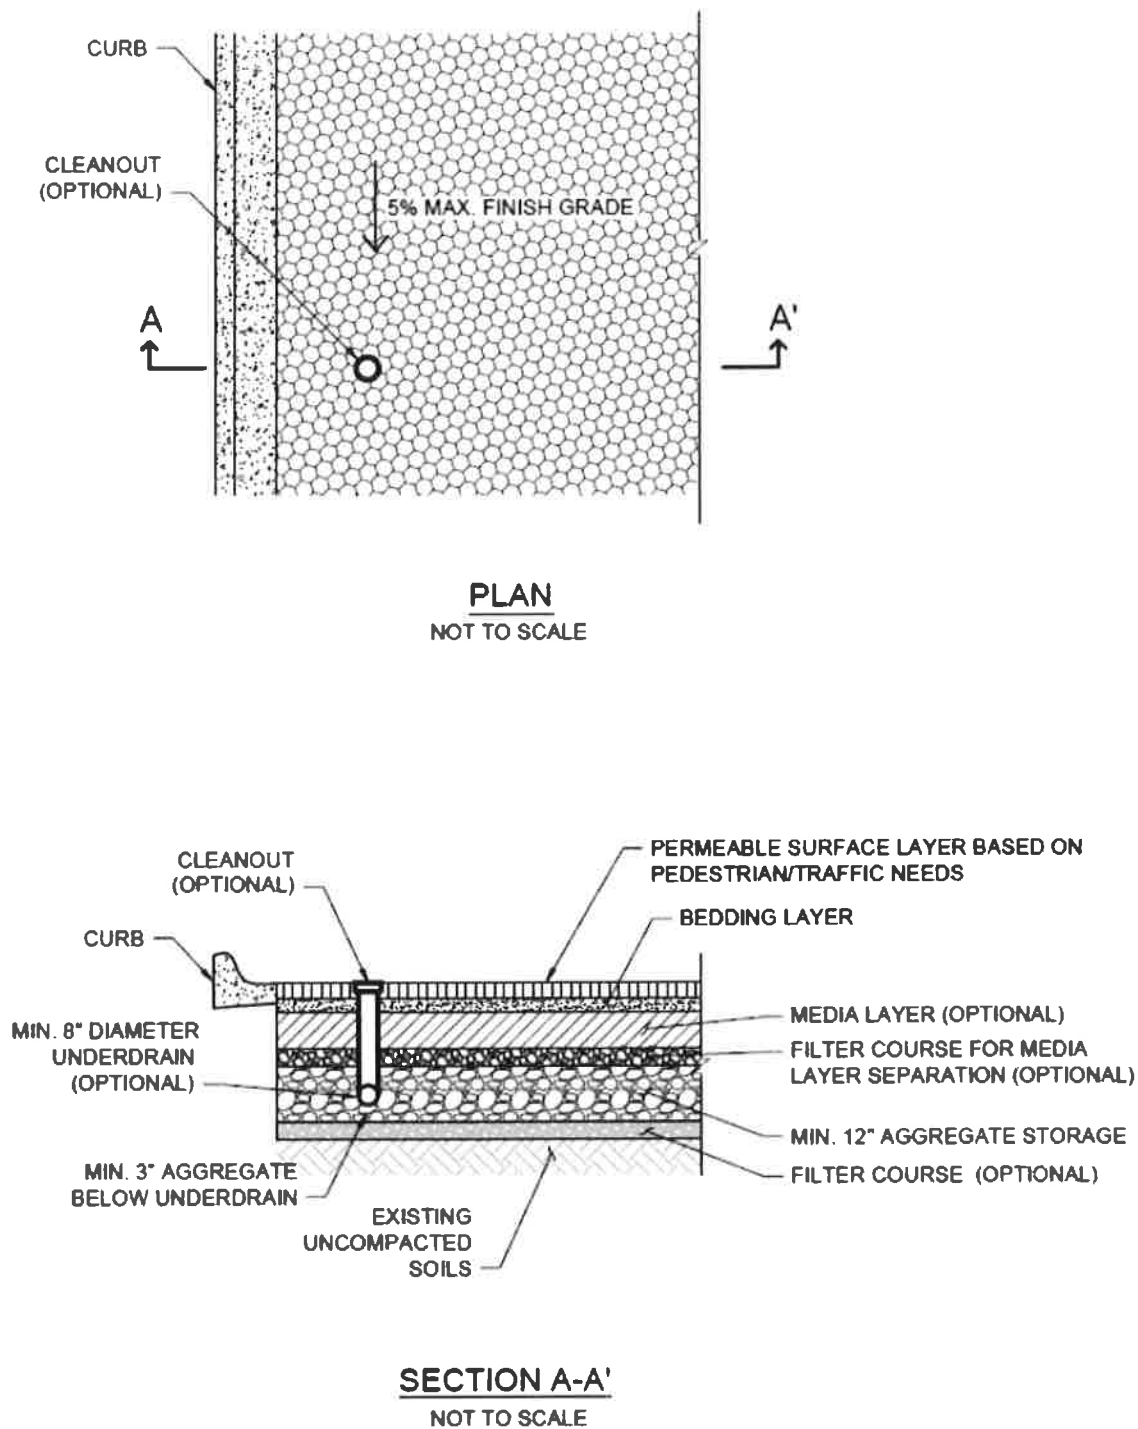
E.11-1: Typical plan and Section view of a Permeable Pavement BMP
